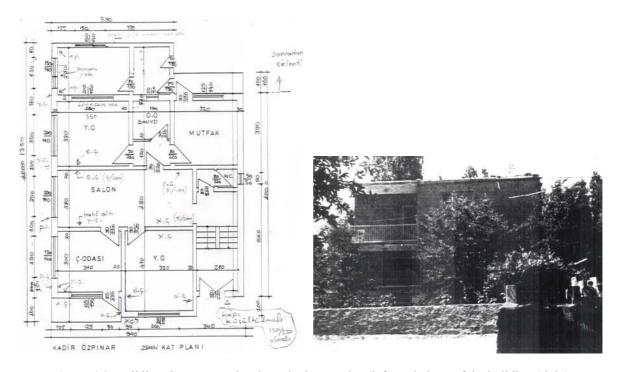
Building-C: Damage sketch on the layout plan (left) and photo of the building (right)
